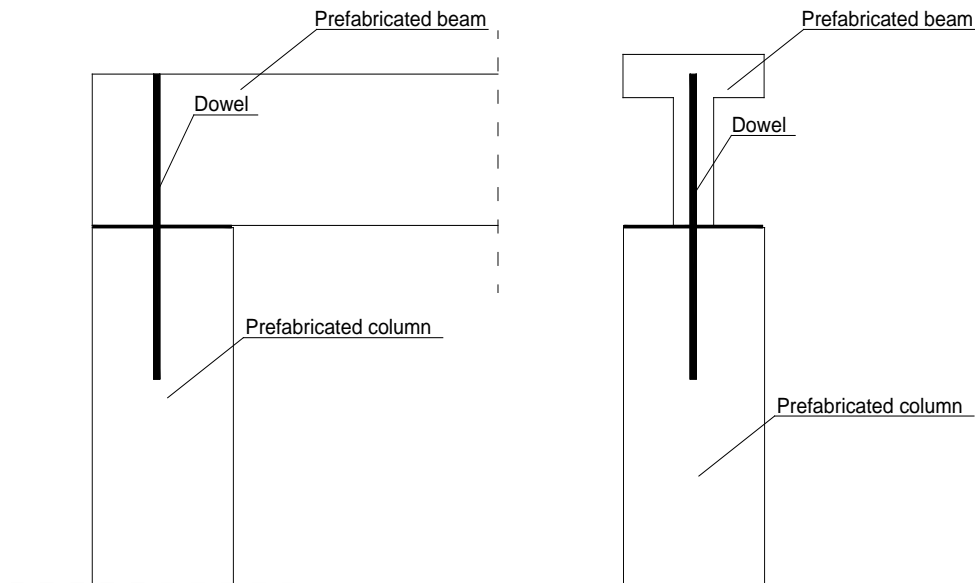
Precast dry beam-to-column connection with T beam section
